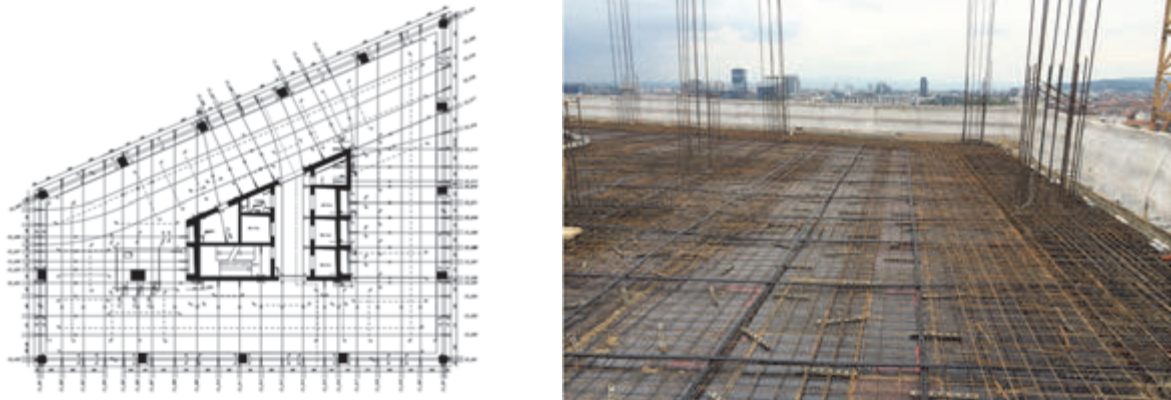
Cable scheme and construction of above ground level prestressed floor slabs in tower B
